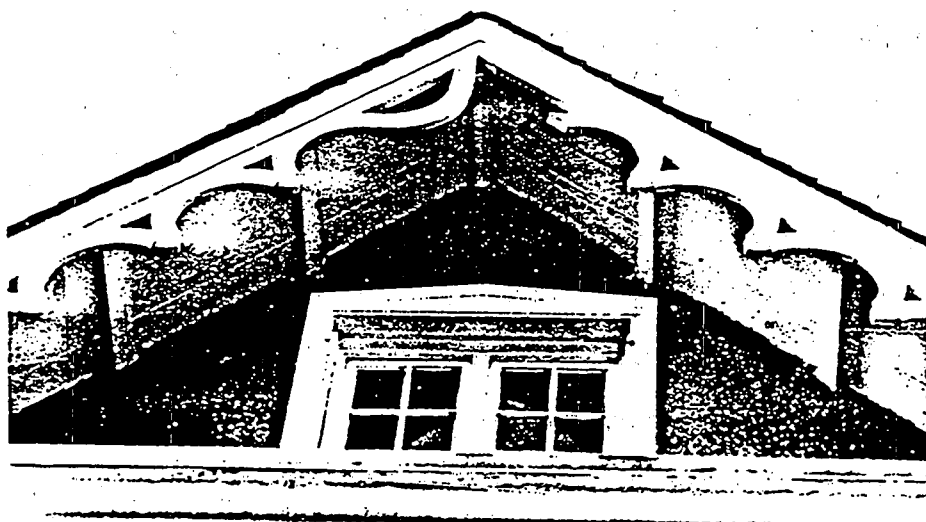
A detail of the broken and cracked bargeboard located on the central south facade gable which should be repaired/replaced.
